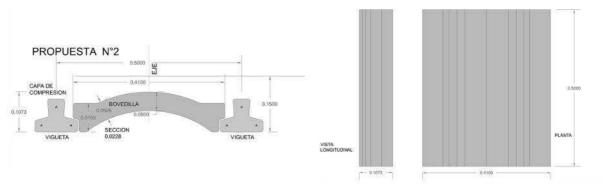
"Plant, longitudinal view and section of the proposal Nº2"
